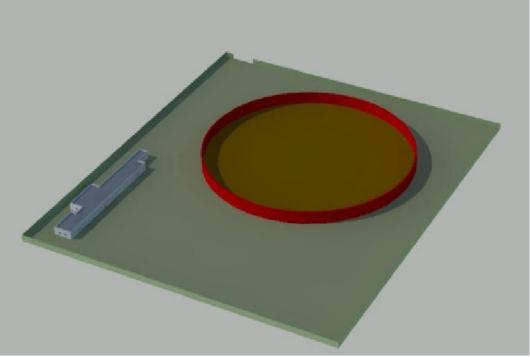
3D LAYOUT OF DEFENSE TRAINING CENTRE
